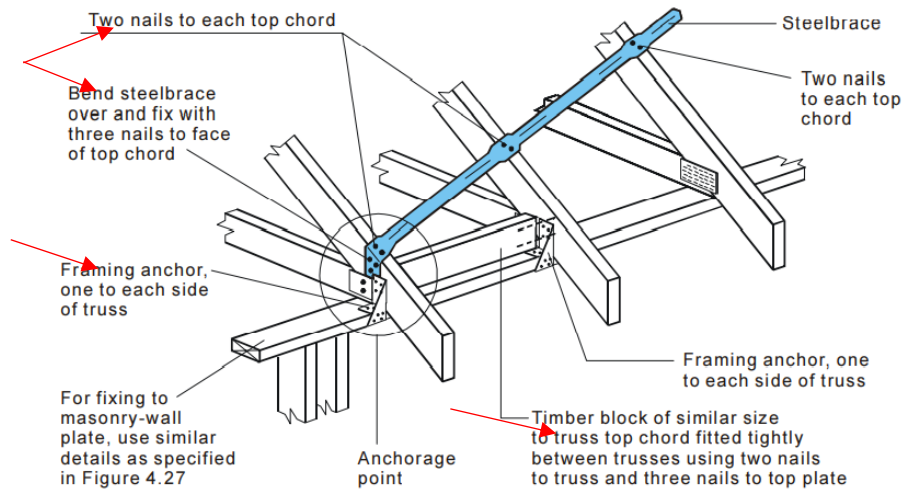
END FIXING DETAILS AT HEEL—TO TOP PLATE (ALTERNATIVE)
